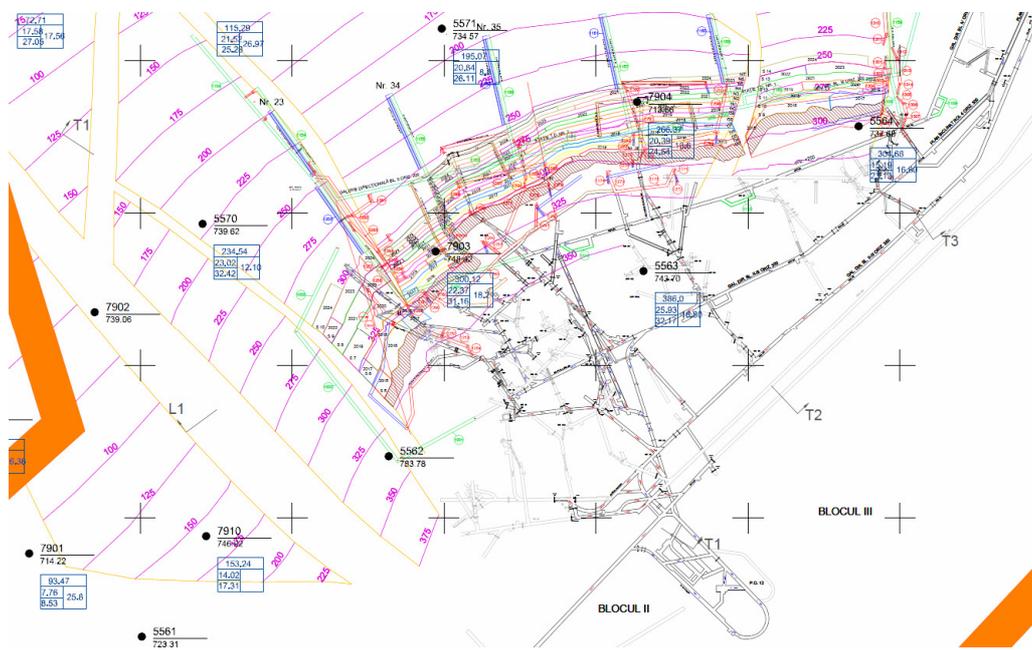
Opening and preparing plan of the coal seam no. 3 [10]
